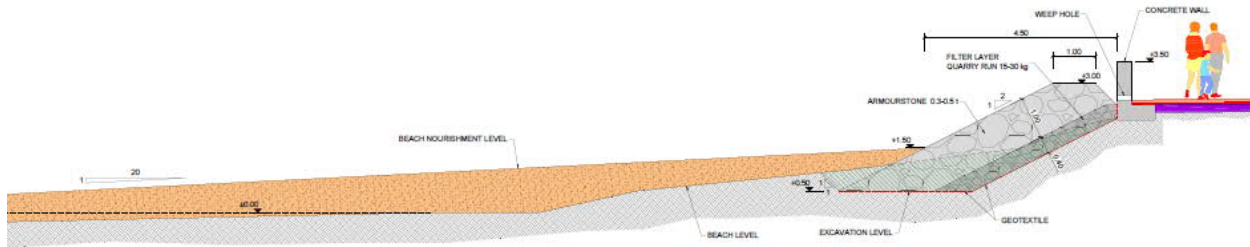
Cross section proposed for Lagarto Bay. Detailed Design December 2021
